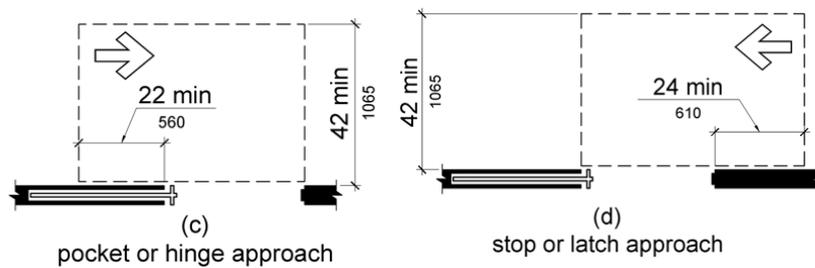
Doorways without doors, sliding doors, and folding doors (Department of Justice, 2010)
